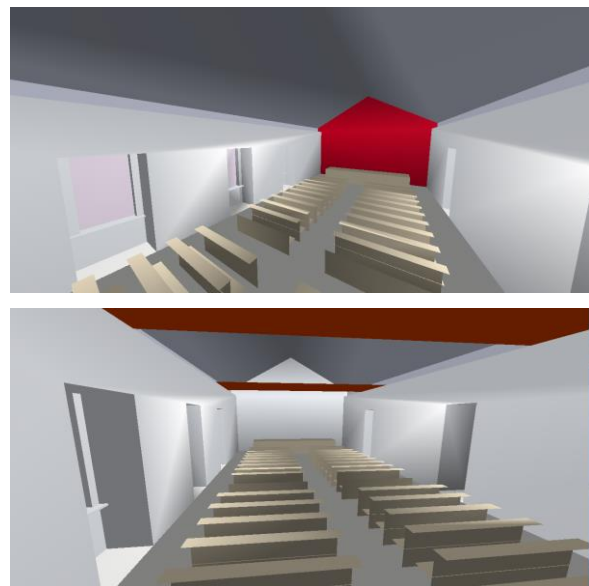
Panels on the wall behind teacher or under the ceiling in the room S3.
